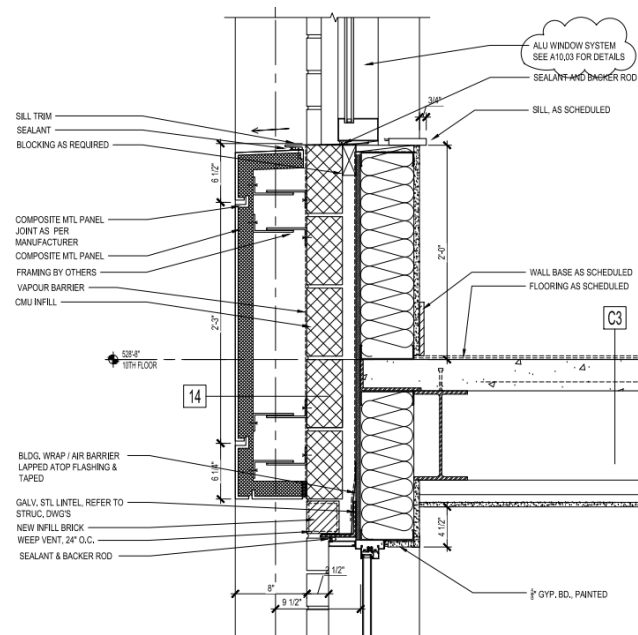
Section through typical exterior wall in addition. From 4A.21.
